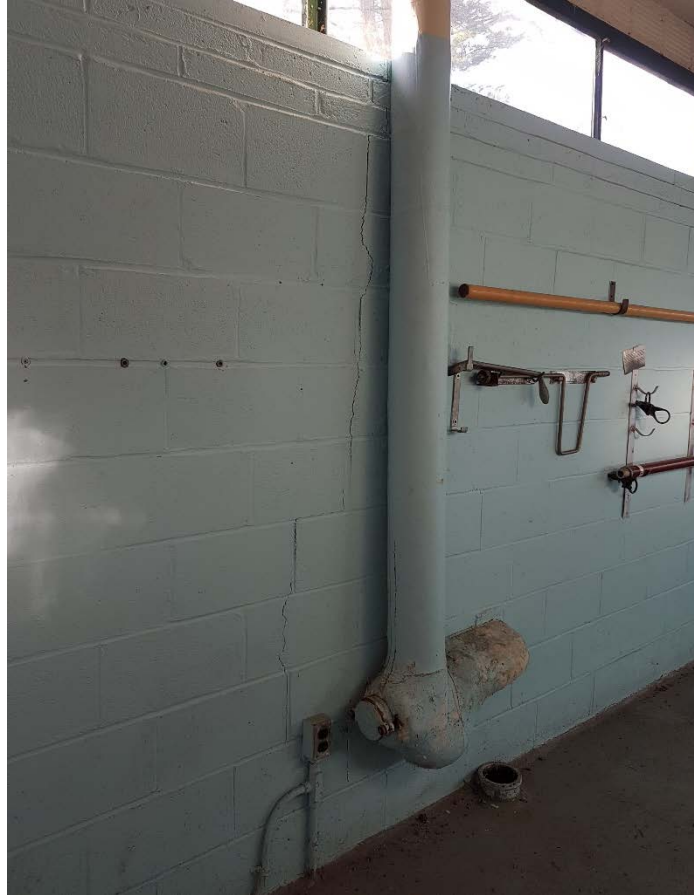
MS6 – Cracked Masonry South Walls
